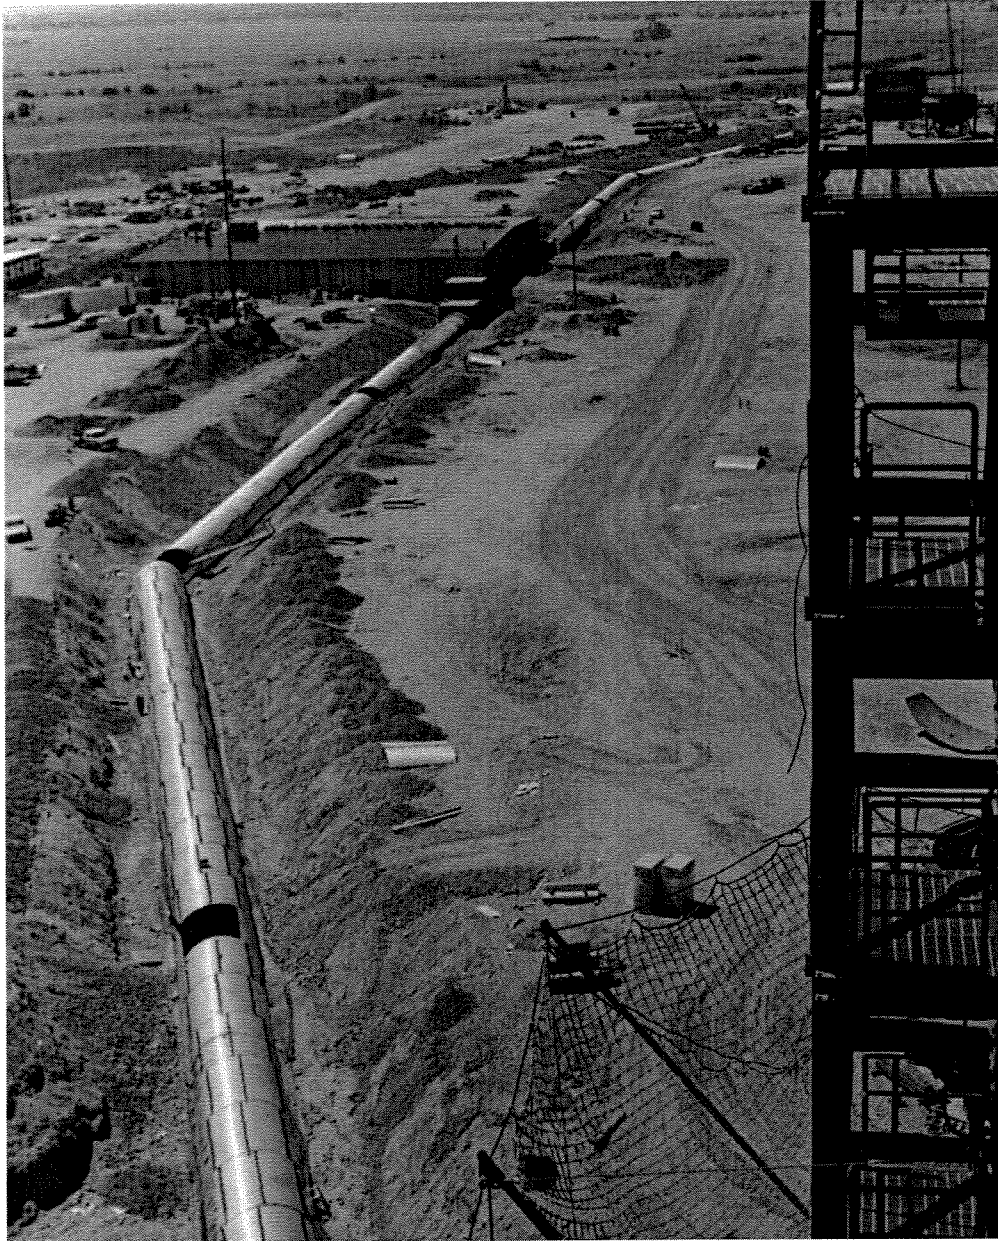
Test Control Center (Unit 121) and construction of the instrumentation tunnels to Test Stand No. 1 and Test Stand No. 3, Beta Test Complex, ca.1964. With Test Stand No. 1 in the foreground (right). Looking west. Courtesy of NASA.
